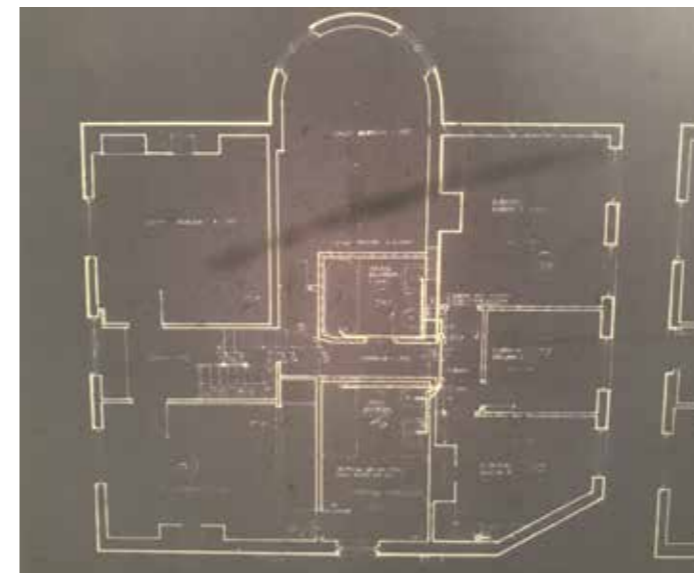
Drawings of first floor proposals, including new toilet, 1973
